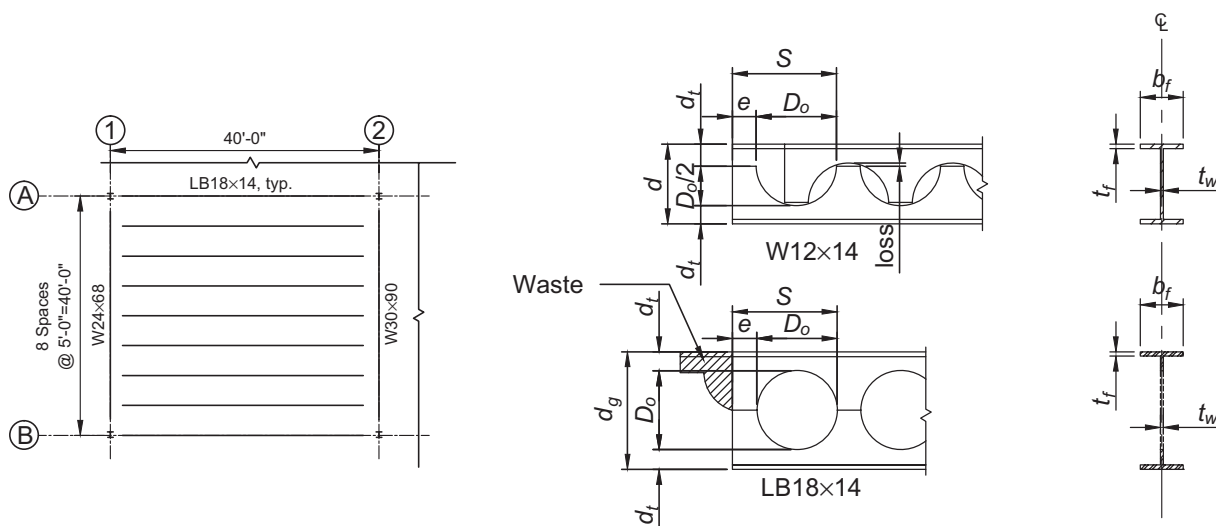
Structural framing layout and cellular beam nomenclature for Example 4.2.
